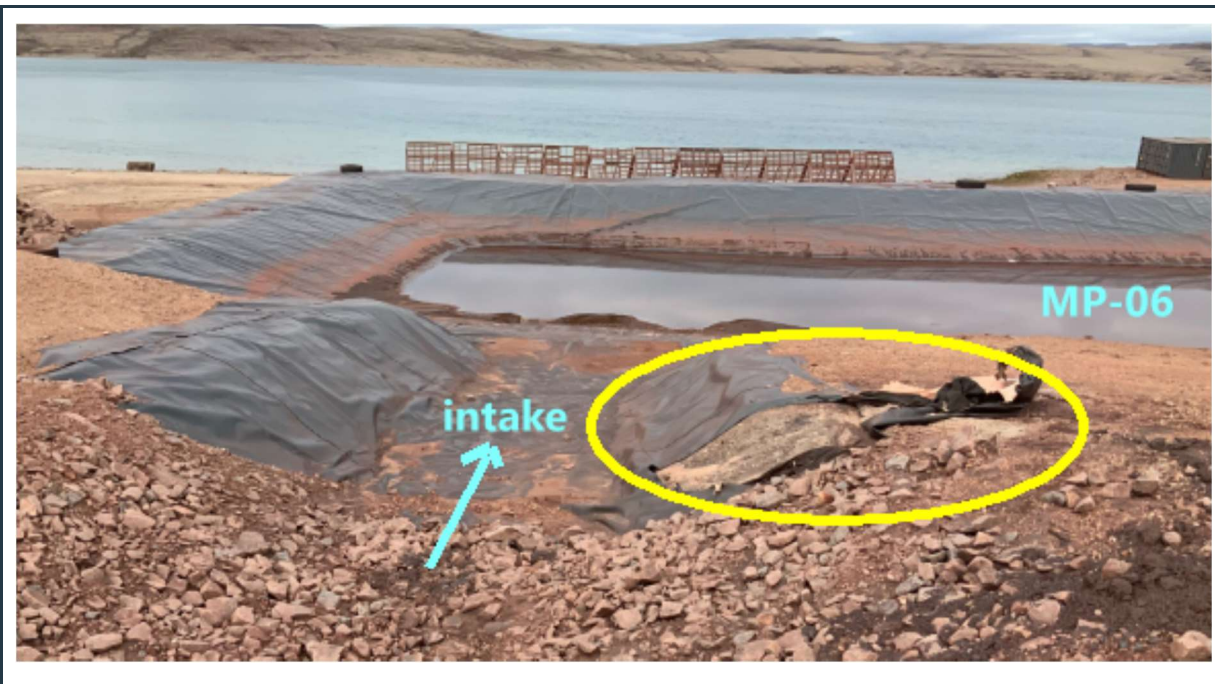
View of the lined MP-06 pond with robust, stable berms (north-west corner of the ore stockpile). Note the liner damage on the slope of the intake to the pond (yellow circle).
